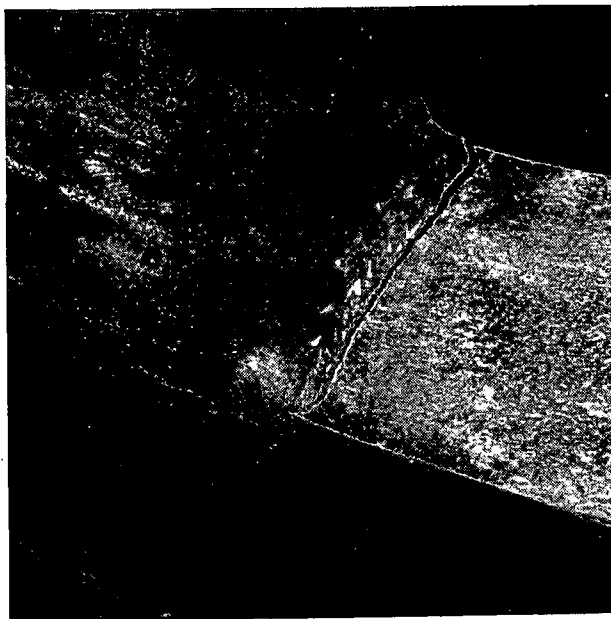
Crack in bracketless construction no. 34 (dynamic tension)
